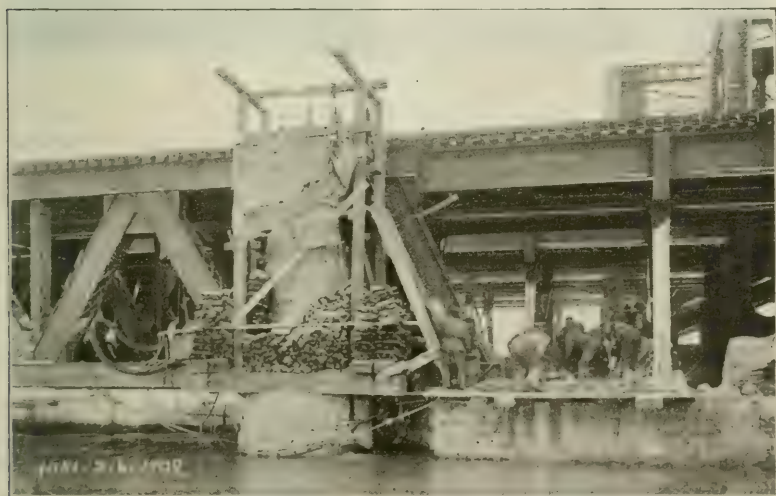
Sinking Cylindrical Pier—At Rear of Masonry Pier, Bridge No. 4. August, 1910
